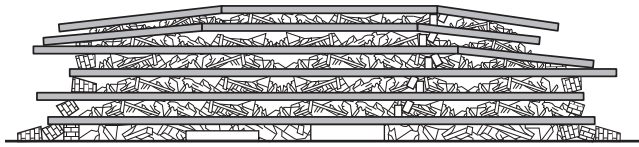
(d) Pancake Collapse Pattern — Heavy Floor Construction.
